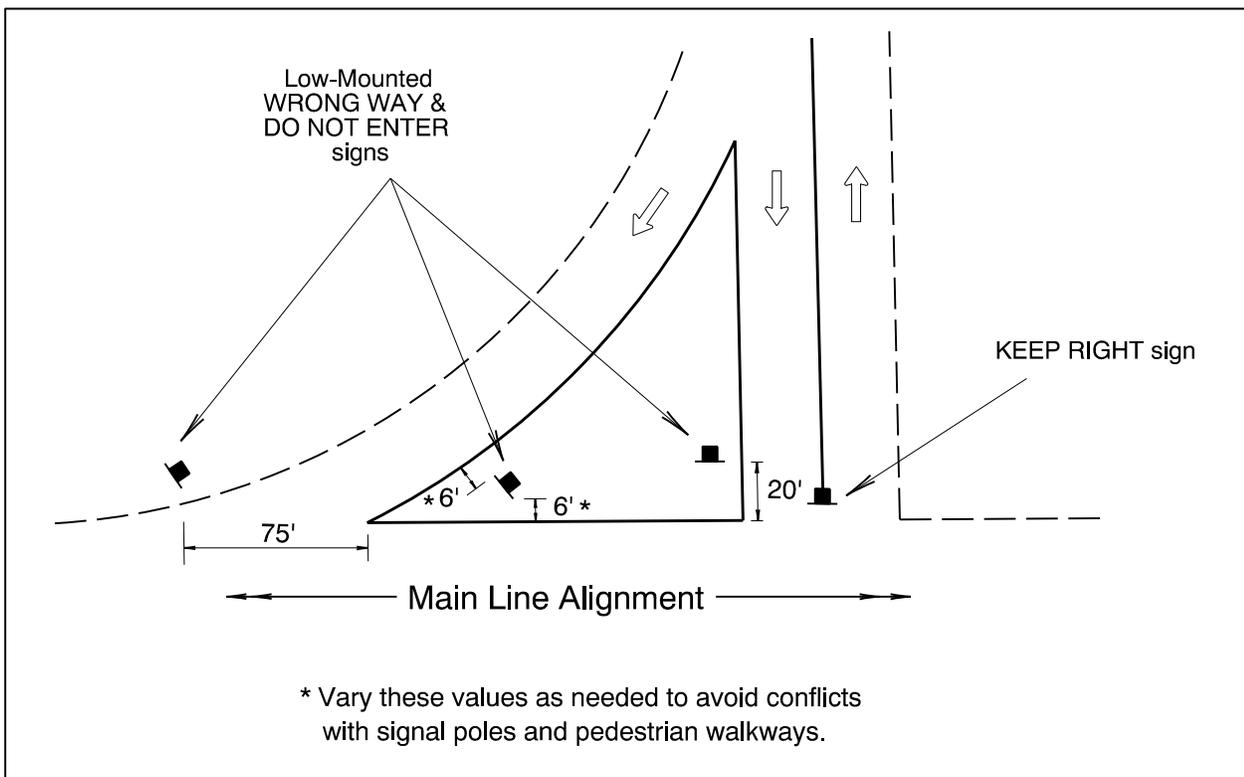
| Typical Signing for Exit Ramp with Right Turn Lane
